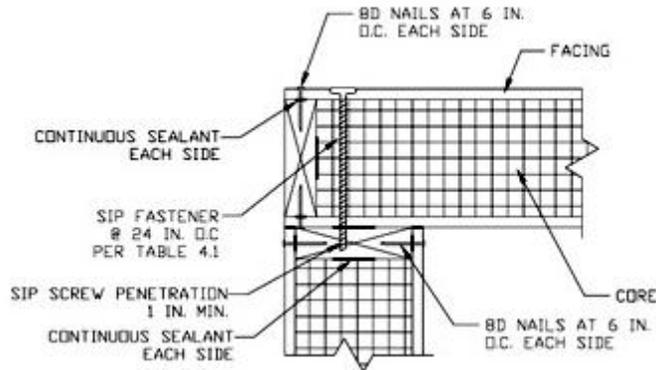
SIP Corner Framing (Structural Insulated Panel Association, 2007)
